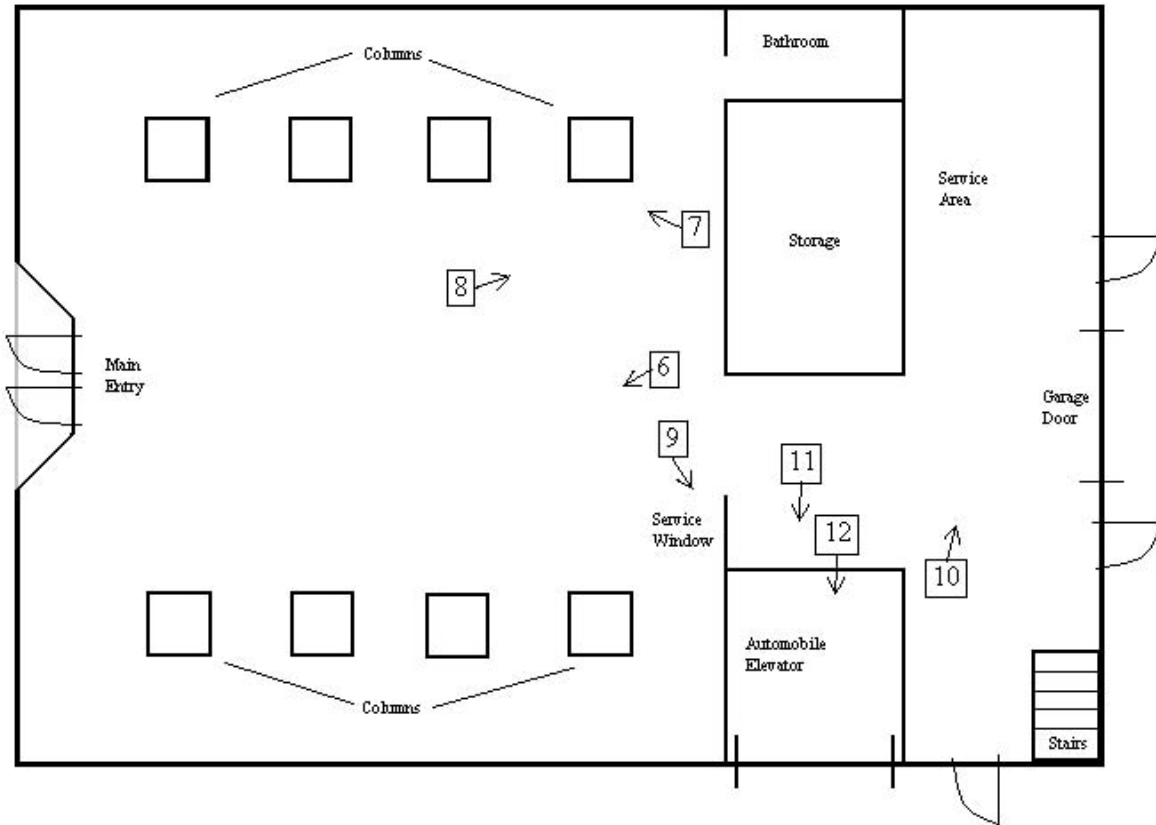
Floor Plan for the Dan E. Snider Ford Dealership Building with photo locations (not to scale)
